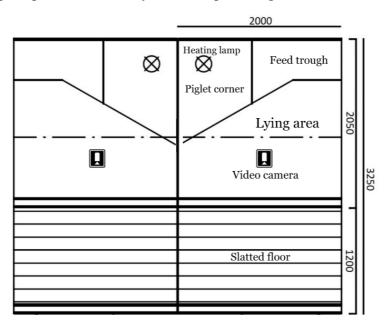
Design of layout for two Swedish loose housing pens. The video camera was installed on the ceiling in the centre of each pen.
